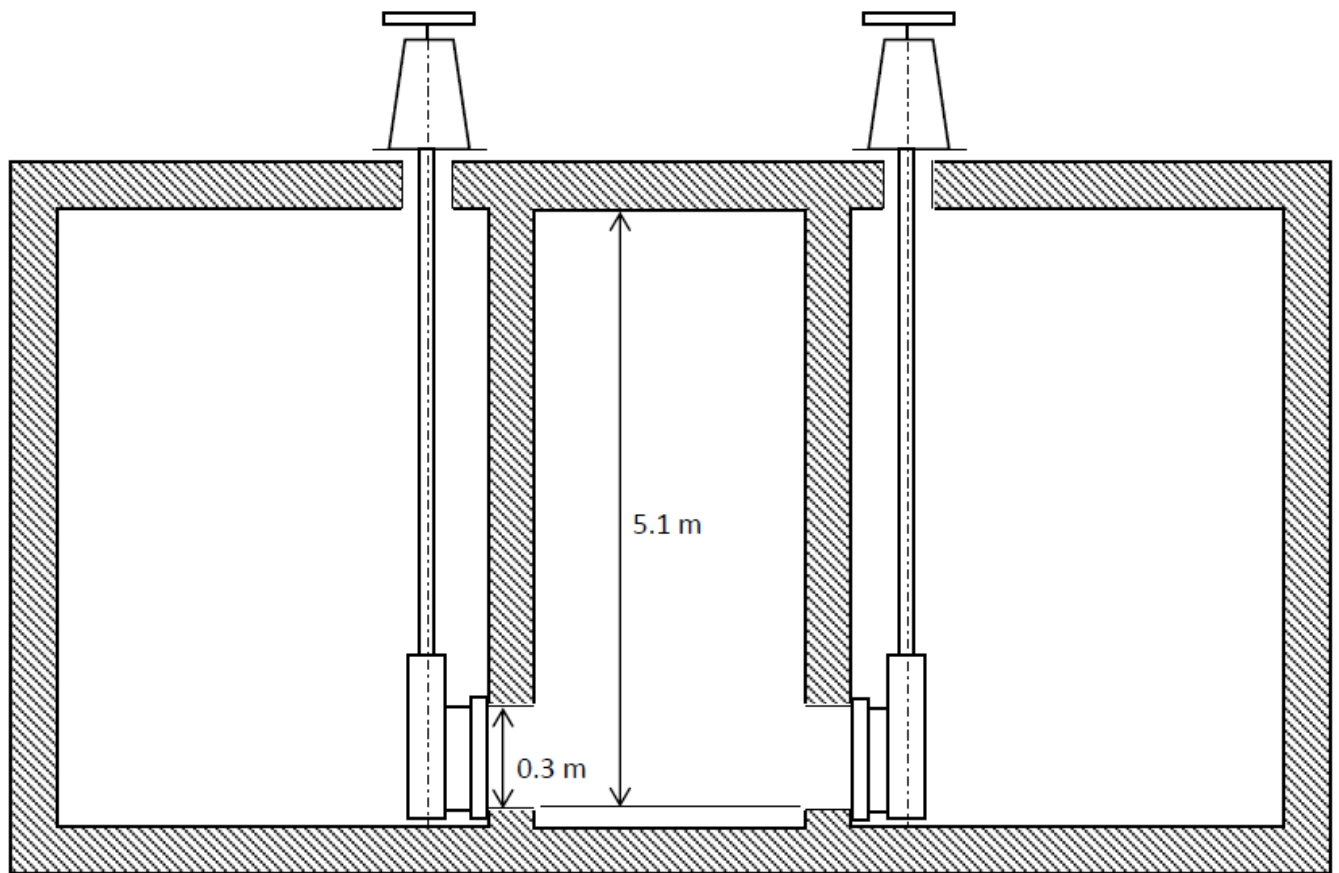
Effluent water system general arrangement isometric dimensions – Detail 1
